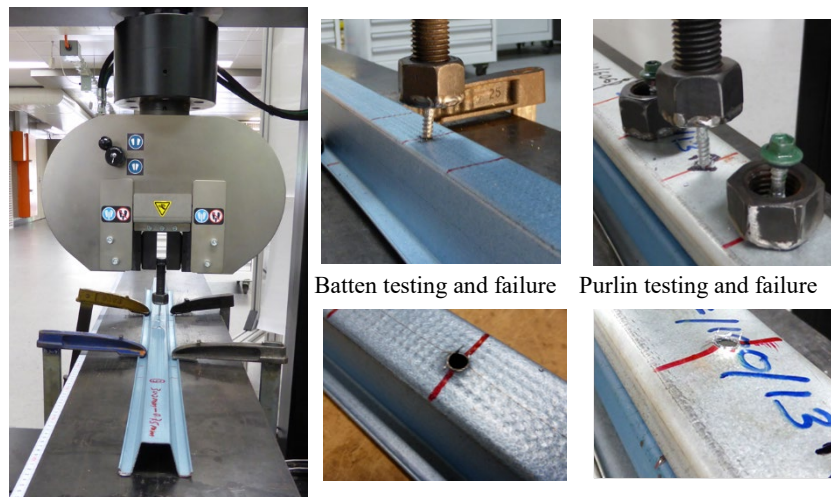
Pull-out tests of battens and purlins and failures
